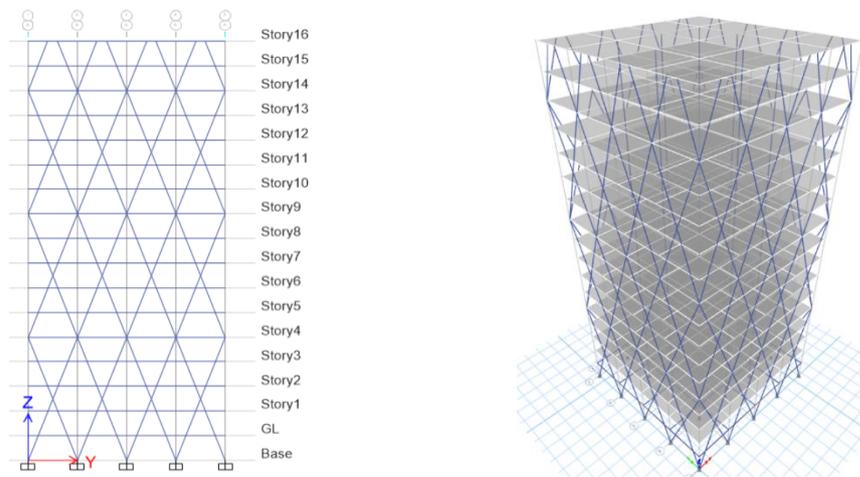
Elevation and 3D View of Diagrid Frame Structure Model 3 with angle as 46.84°.
